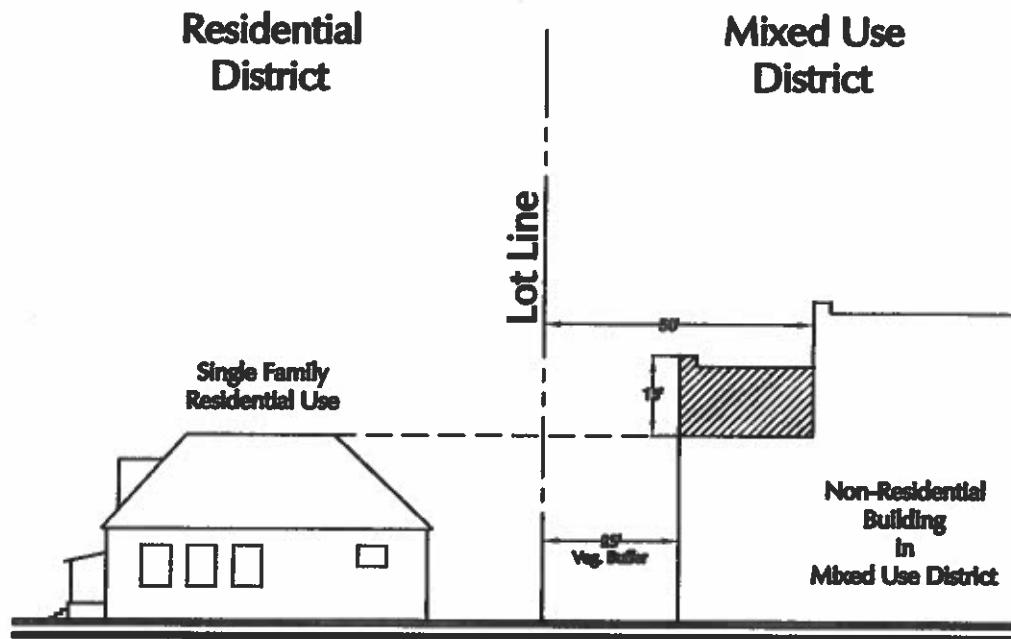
Height Restrictions between Single Family Residential Use within a Residential District and a Mixed Use Building within a Mixed Use District.
